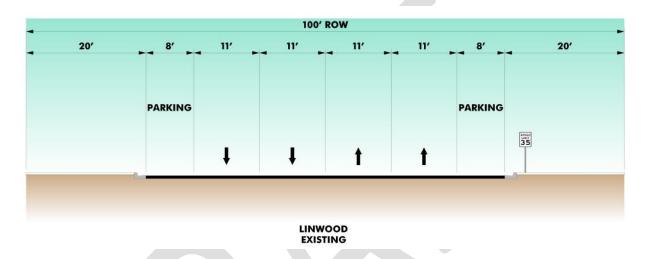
Enhanced Streetcar Linwood Blvd Typical Section, Existing Conditions
